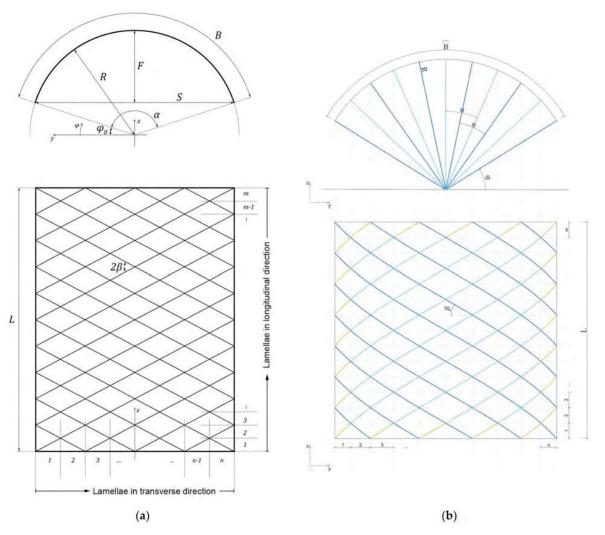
Floor plan and section of the lamella vault for geometrical analysis (a) by Tutsch [13]; (b) by the authors.
